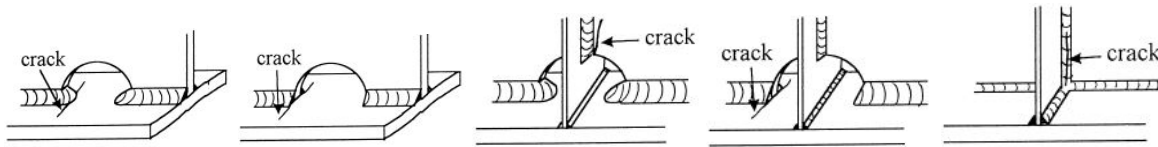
Fatigue cracks observed for cope hole details existing in I-beam sections [37]
